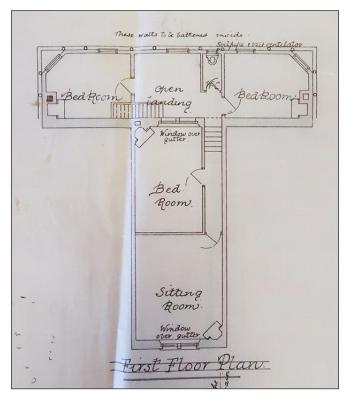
First-floor plan of the manager's accommodation, 1898, Price & Wooler. [Original held at Somerset Heritage Trust, SHC D/B/wsm/24/1/629]
